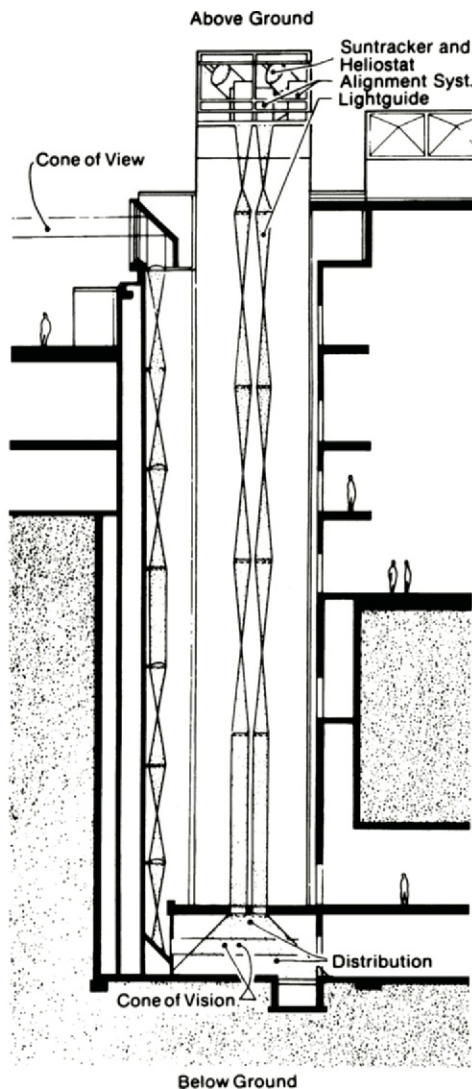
The Civil/Mineral Engineering Building at the University of Minnesota in St. Paul uses beamed daylighting to light underground areas of the building. Images of the outdoors can also be beamed to the far interior or underground. (From *Building Control Systems* by V Bradshaw, © John Wiley & Sons, Inc., 1985.)
